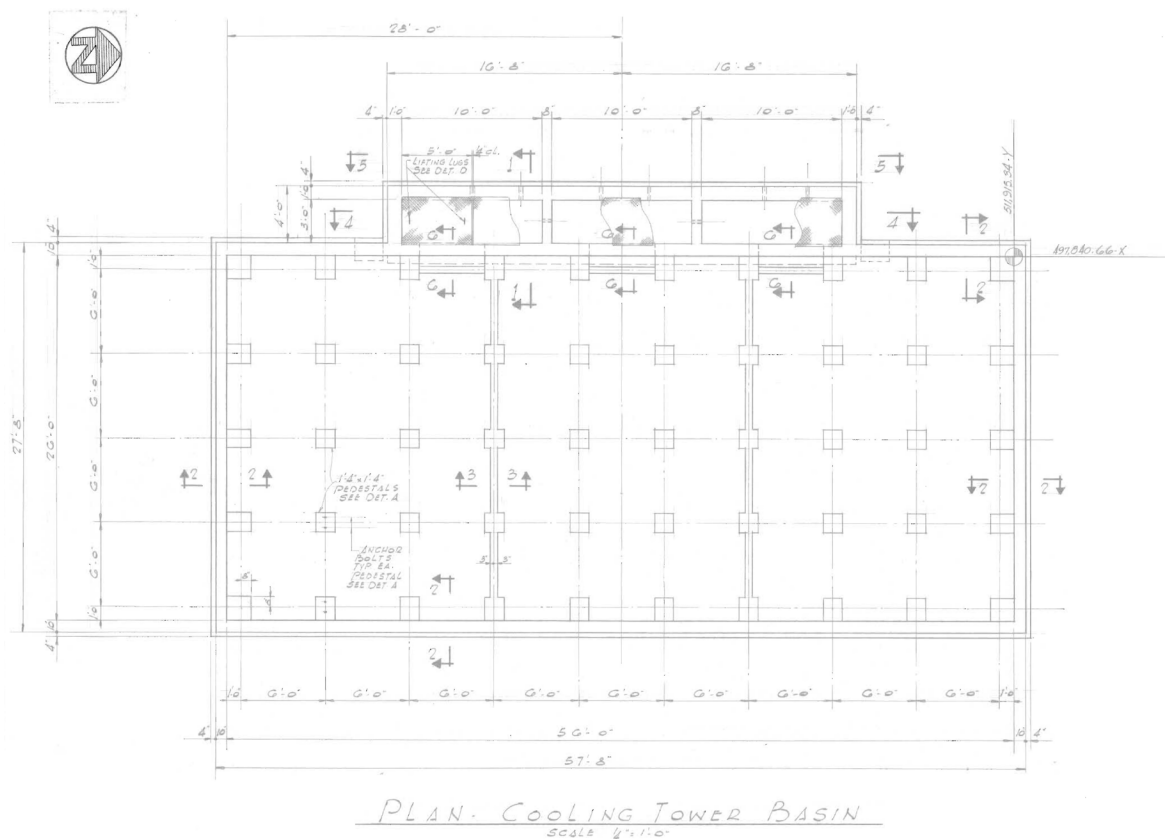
Property 24065, foundation plan from 1959 WS-IO plans.
